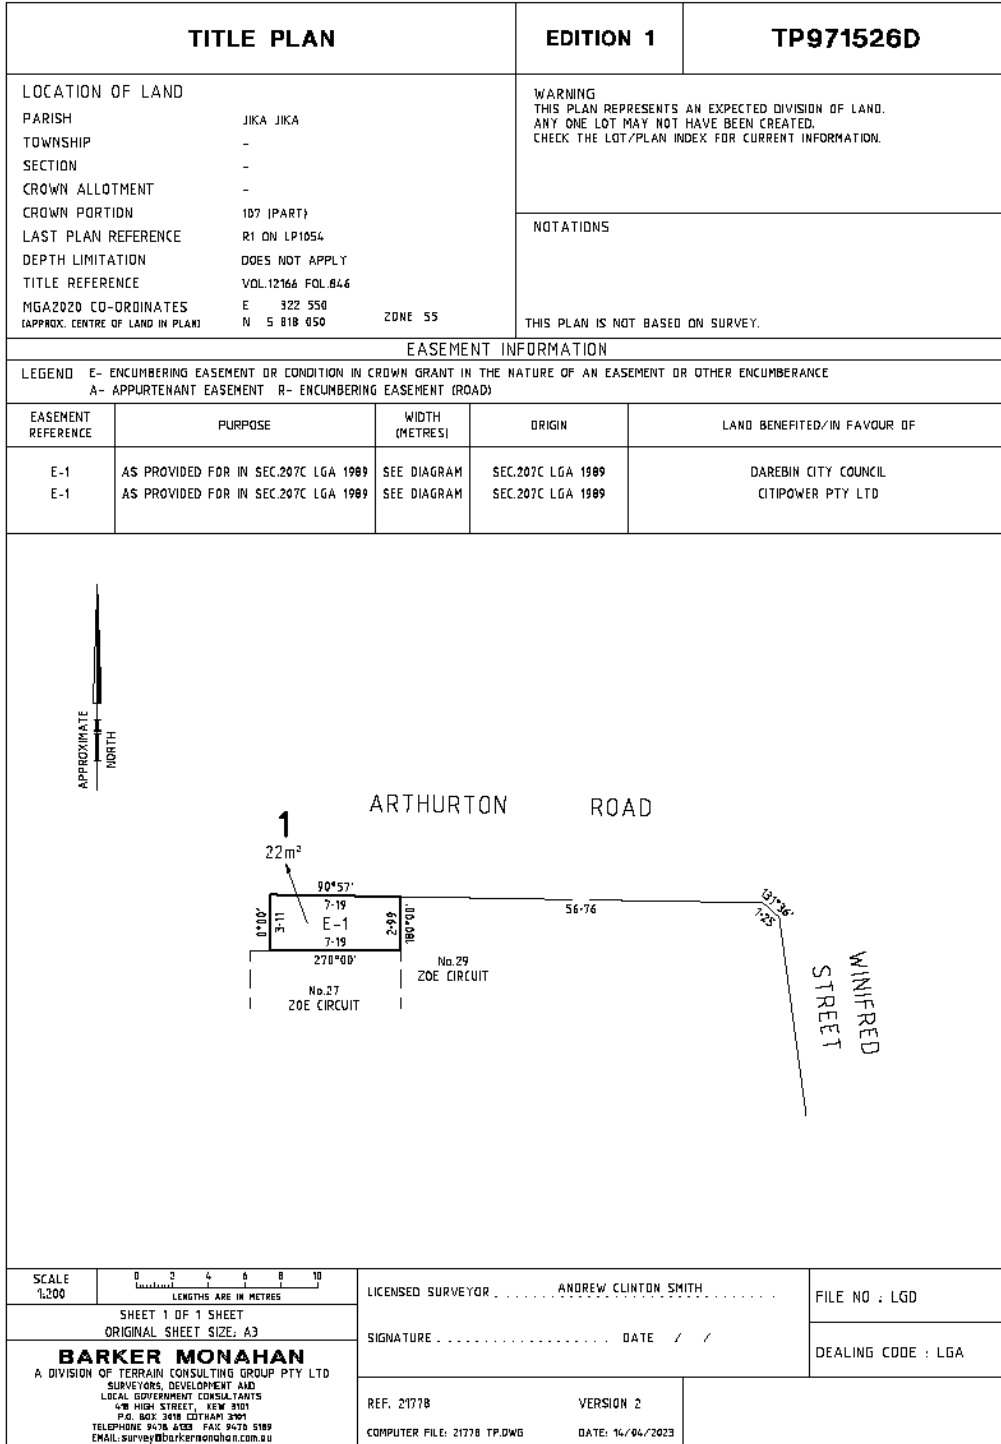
Overall Plan road adjoining 27 Zoe Circuit, Northcote.
